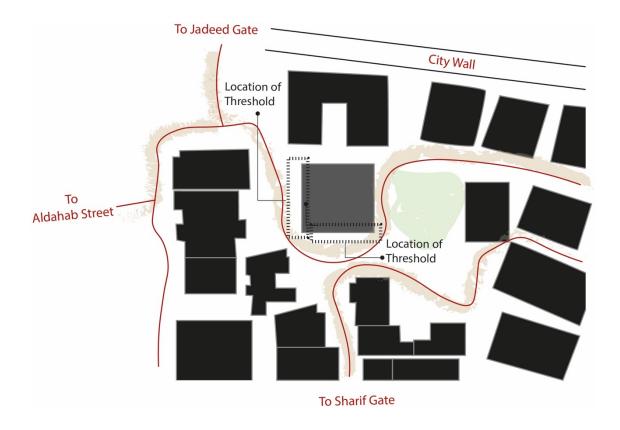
Site plan showing Al Hazazi house and the surrounding houses as well as the town wall. Source: Author.
